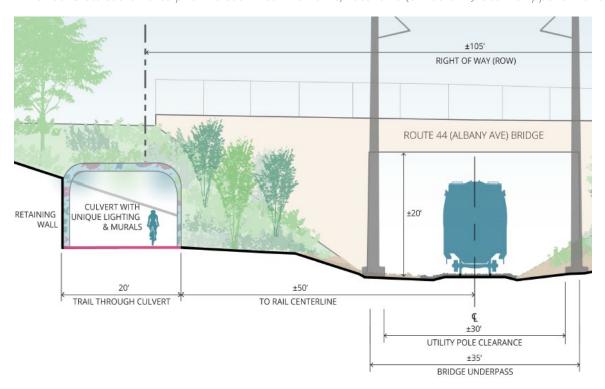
Cross Section excerpt of the Southwest Alternative, Location 4 (at Woodland Street). See the Appendix for all cross sections.
